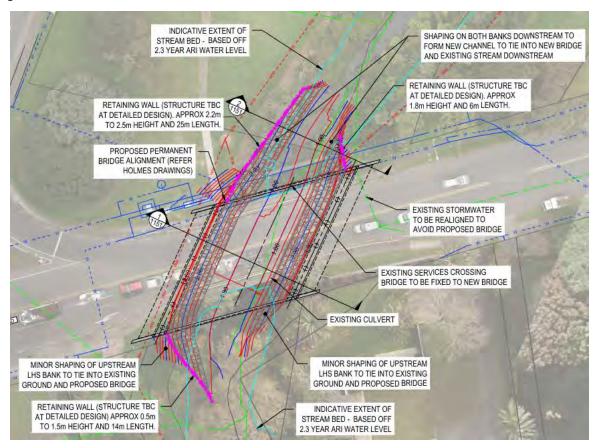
Construction works relevant to Walmsley Road bridge replacement relevant to geotechnical or groundwater matters.
